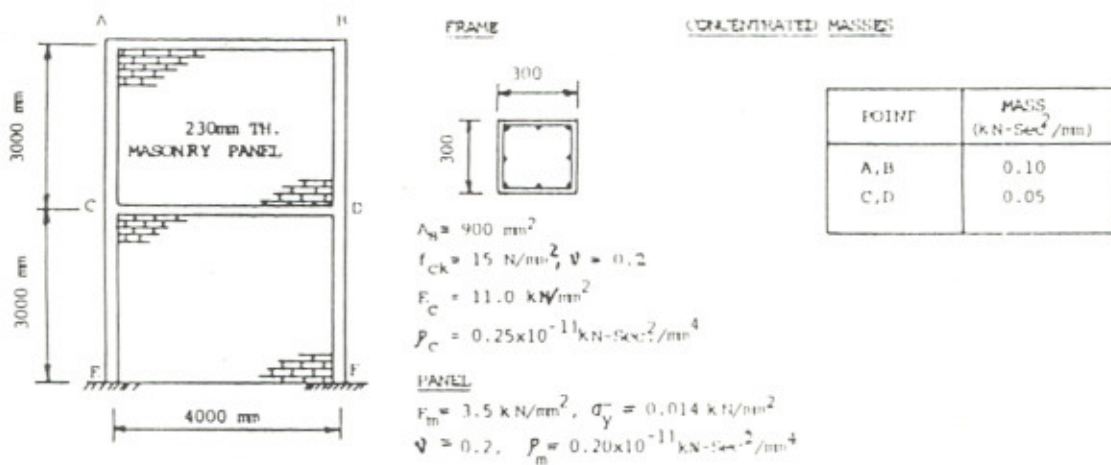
Geometry and X-sectional Details of Reinforced Concrete Infilled Frame-2
